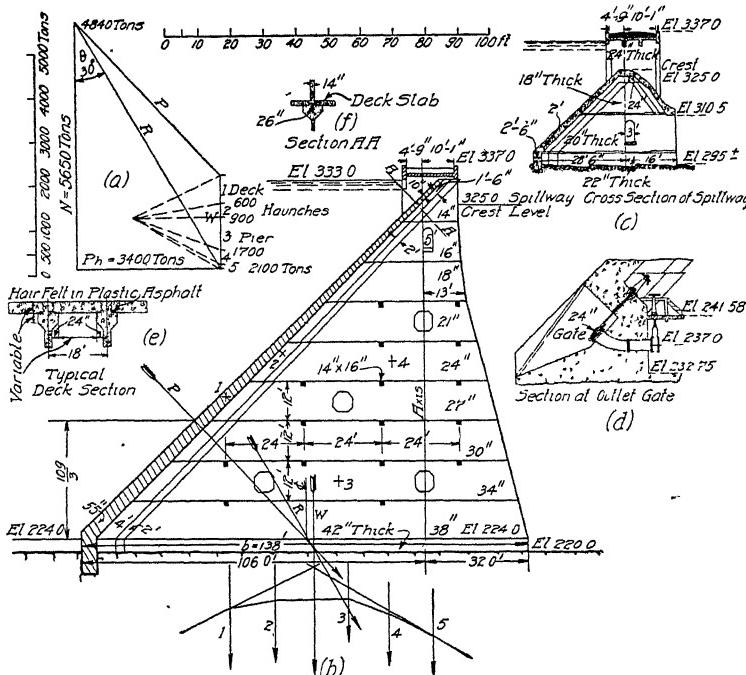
Profile and Detailed Sections of Guayabal Dam, Porto Rico
